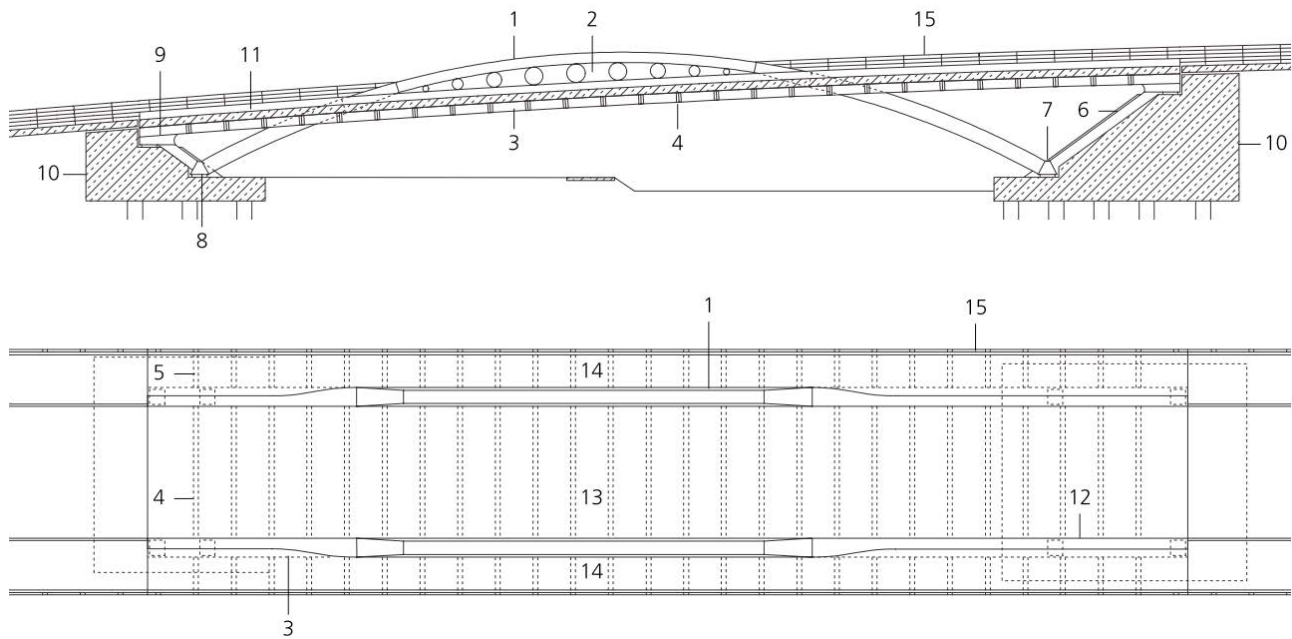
Structure of Cala Galdana Bridge on Menorca (Spain)
